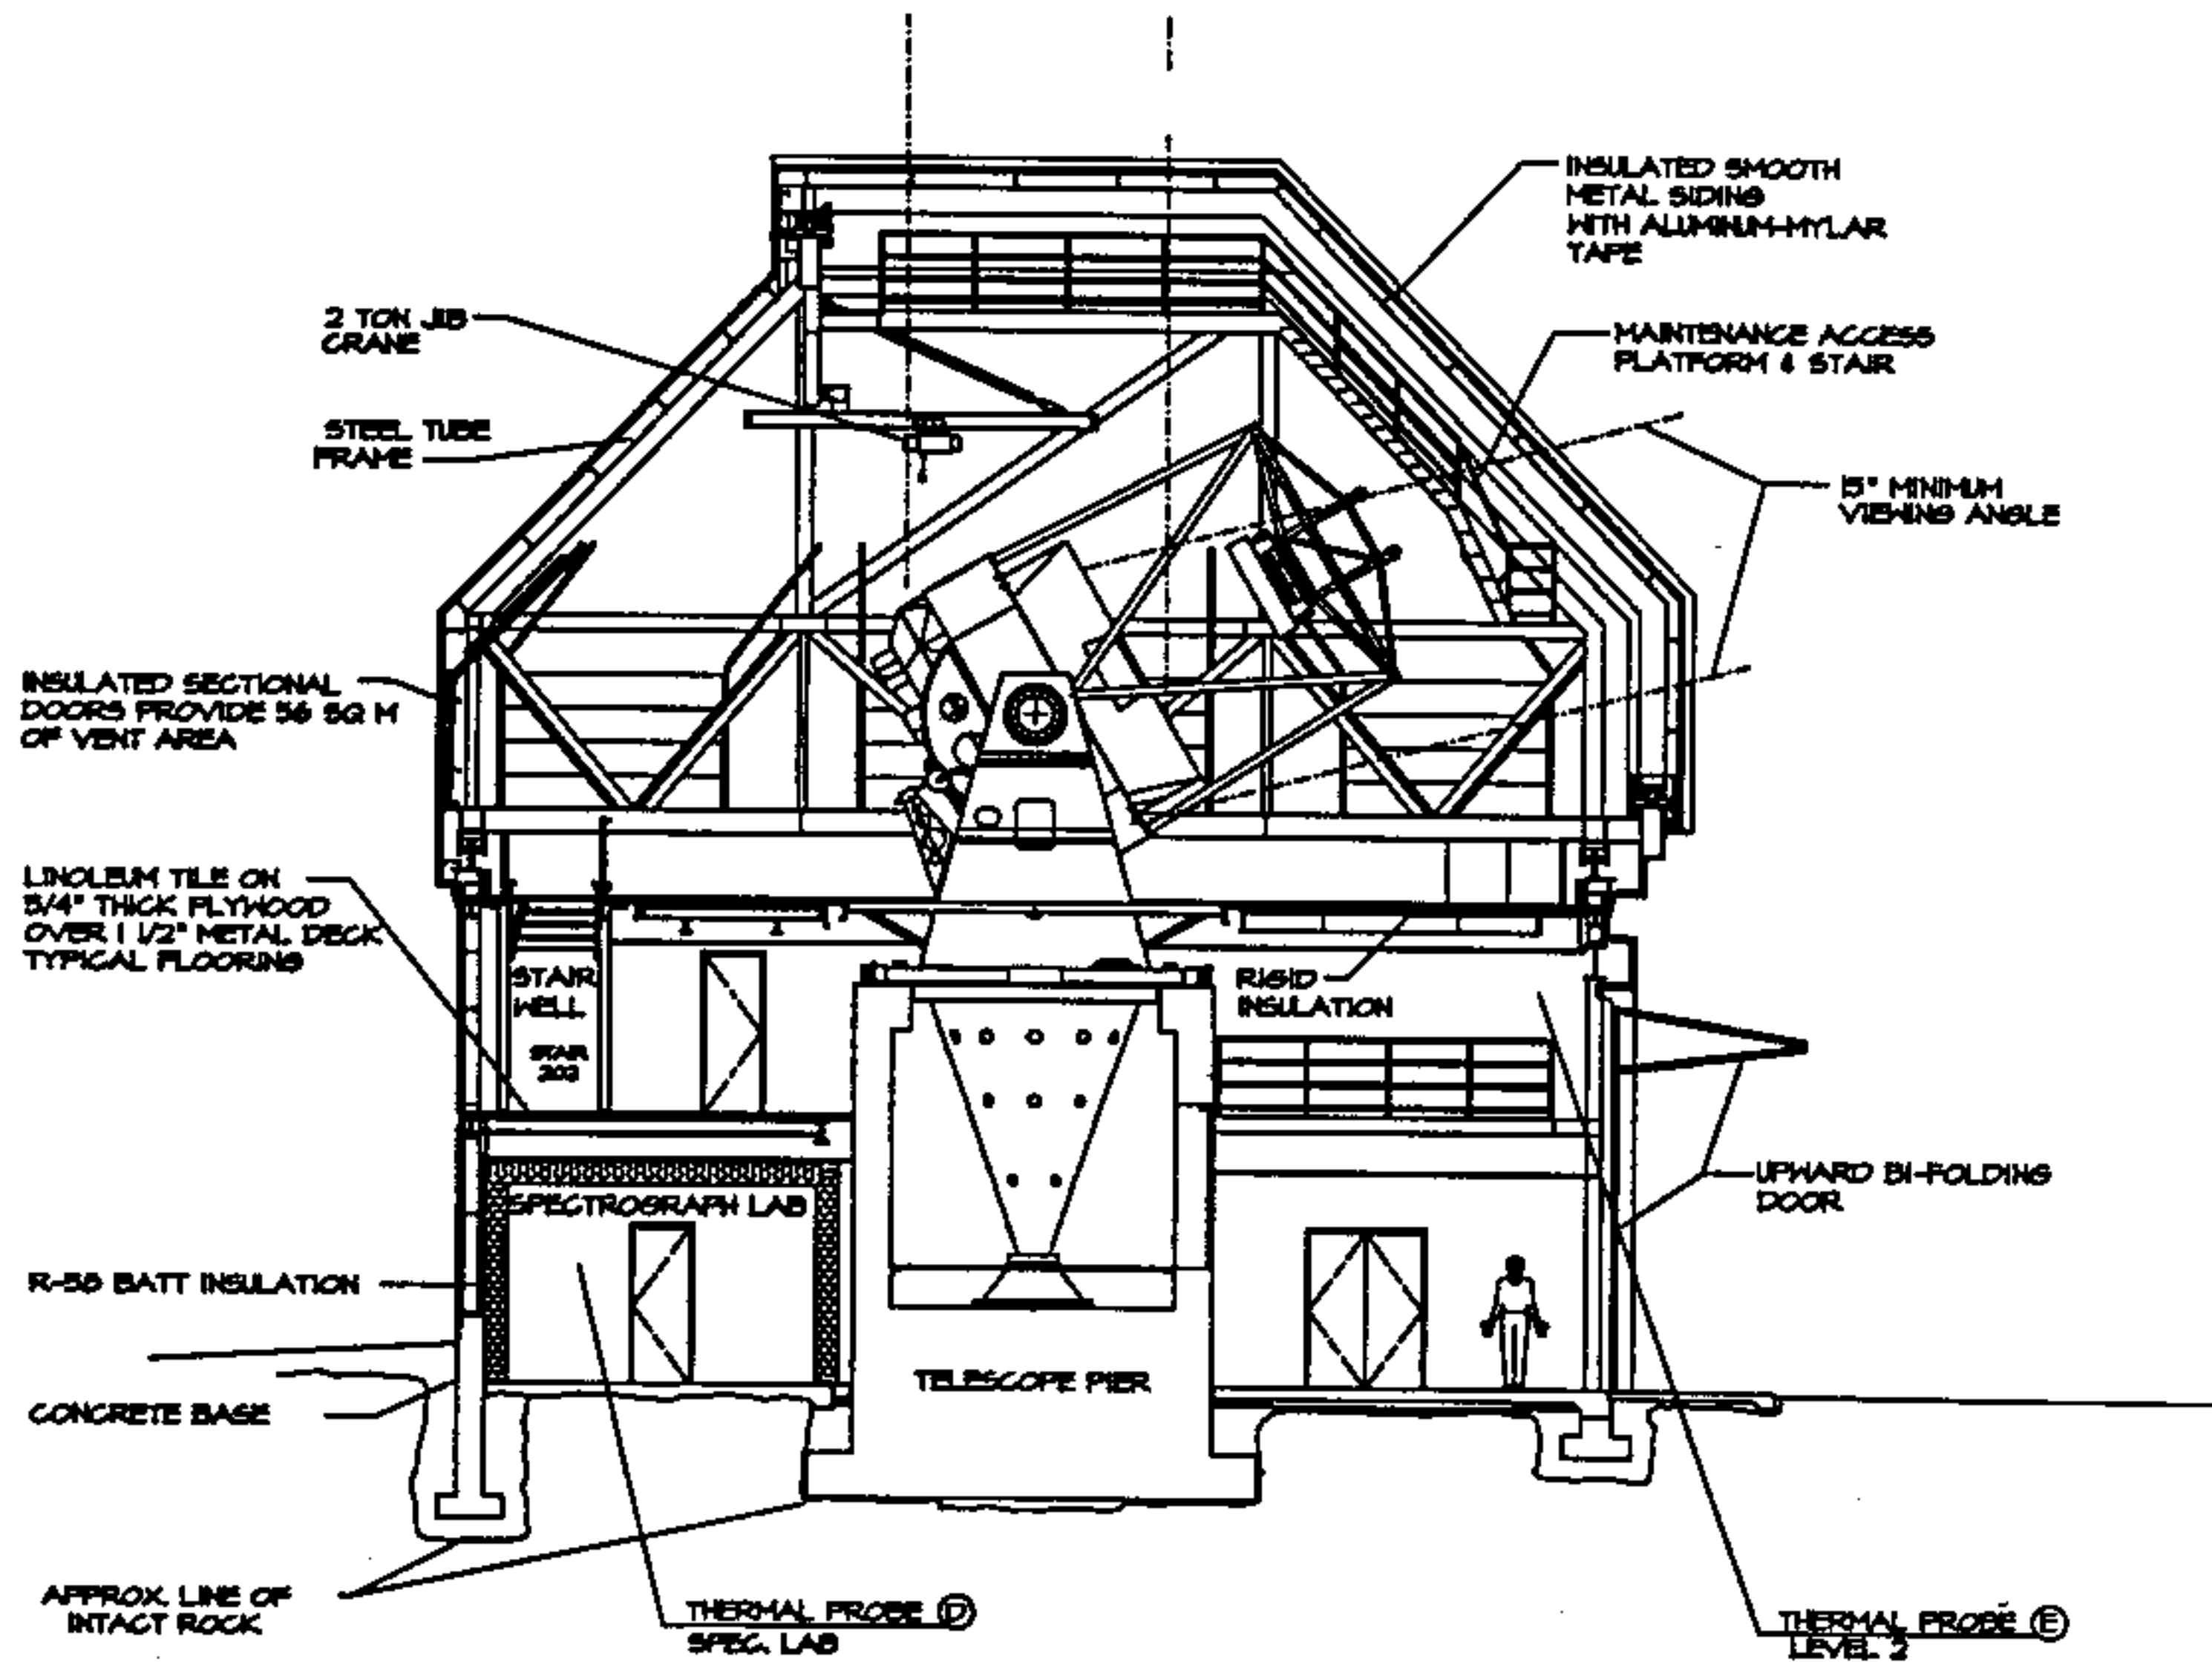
Sectional views of the WIYN telescope enclosure looking towards the north.
